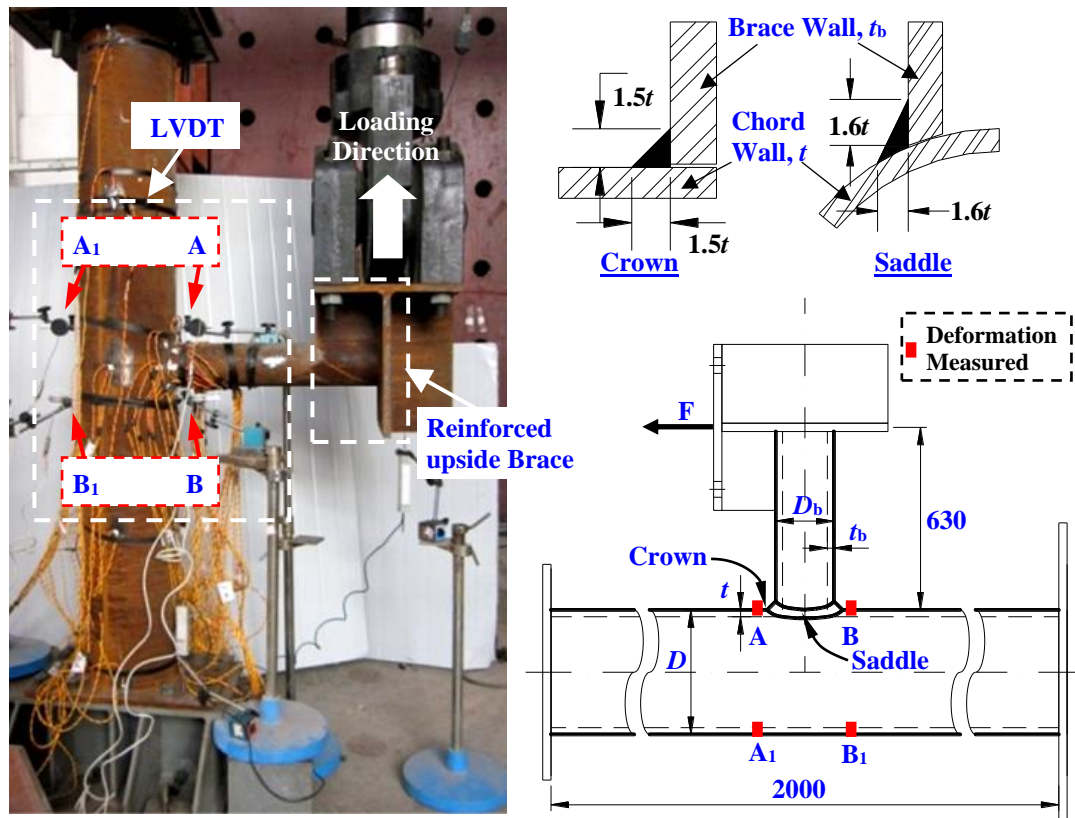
Test set-up for specimens subjected to in-plane bending (Unit: mm)
